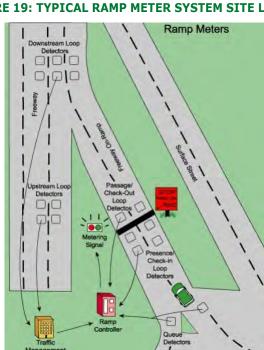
TYPICAL RAMP METER SYSTEM SITE LAYOUT
